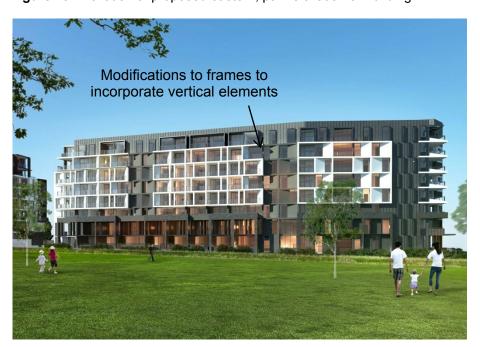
Photomontage of proposed eastern, park elevation of Building 4B
